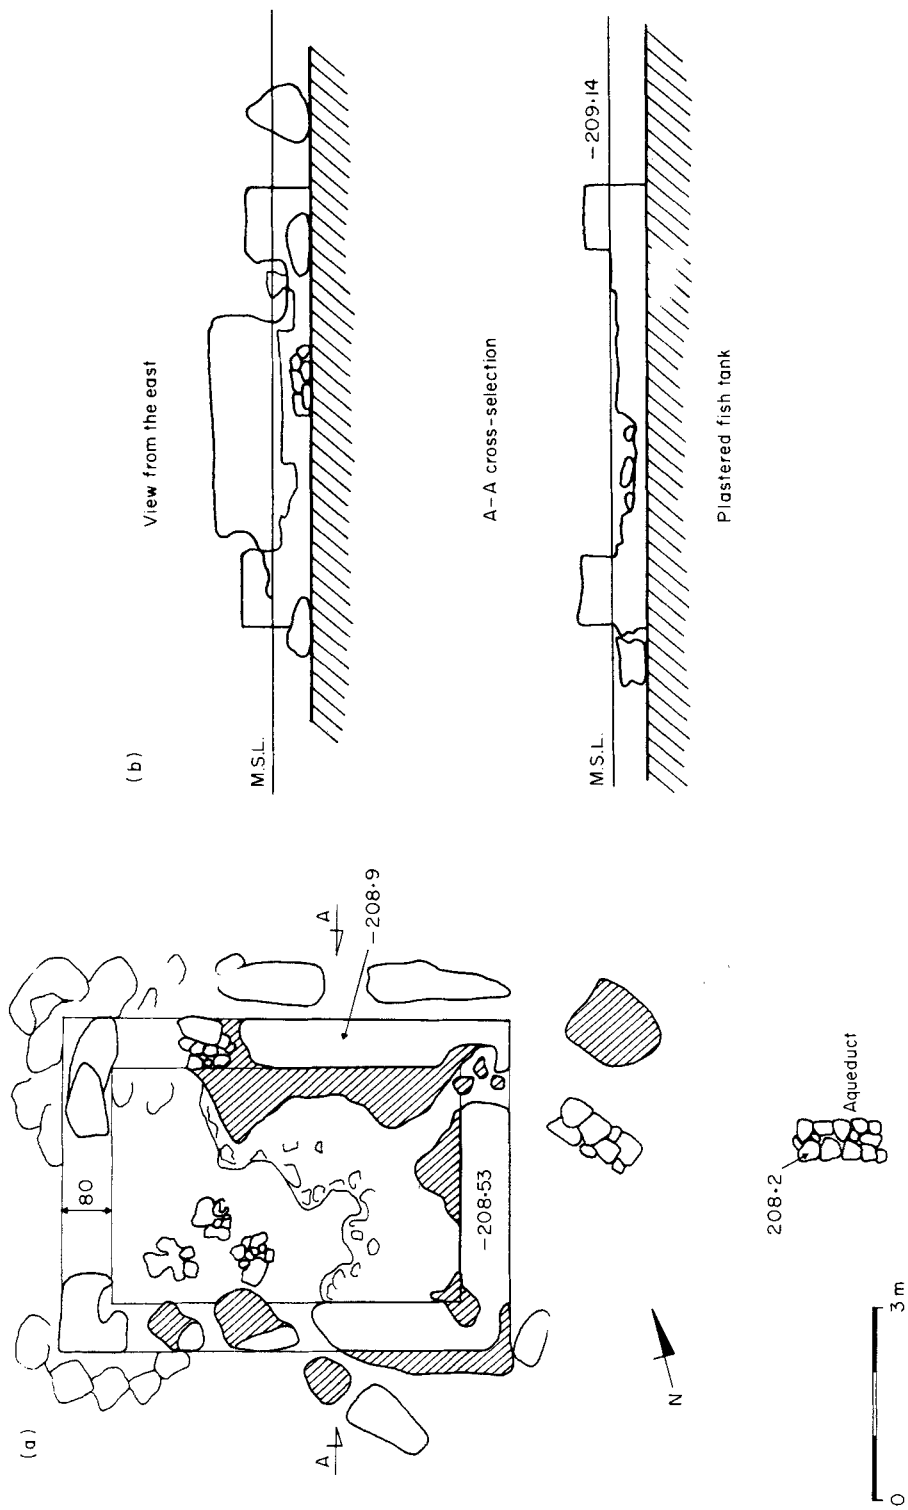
(a) Plan and (b) sections of the fish tank next to the anchorage at Kursi.
